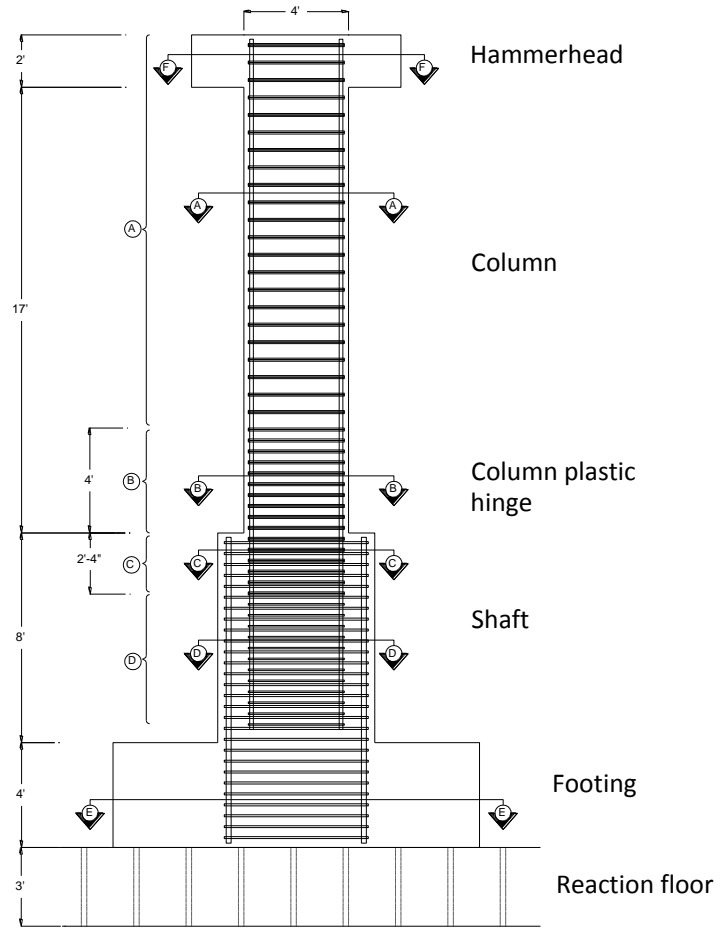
Elevation of test setup (Lotfizadeh, 2019).
